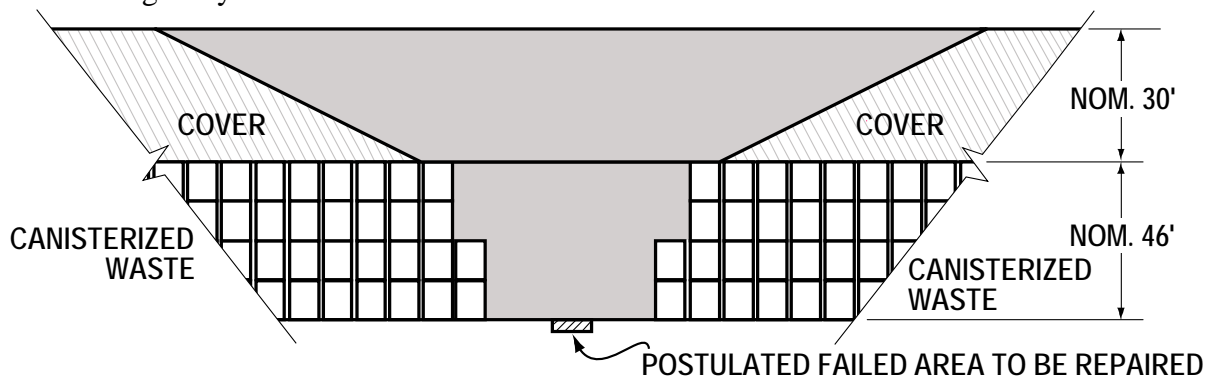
Depiction of Excavation Required to Repair Postulated Failed Area at Center of CWF
